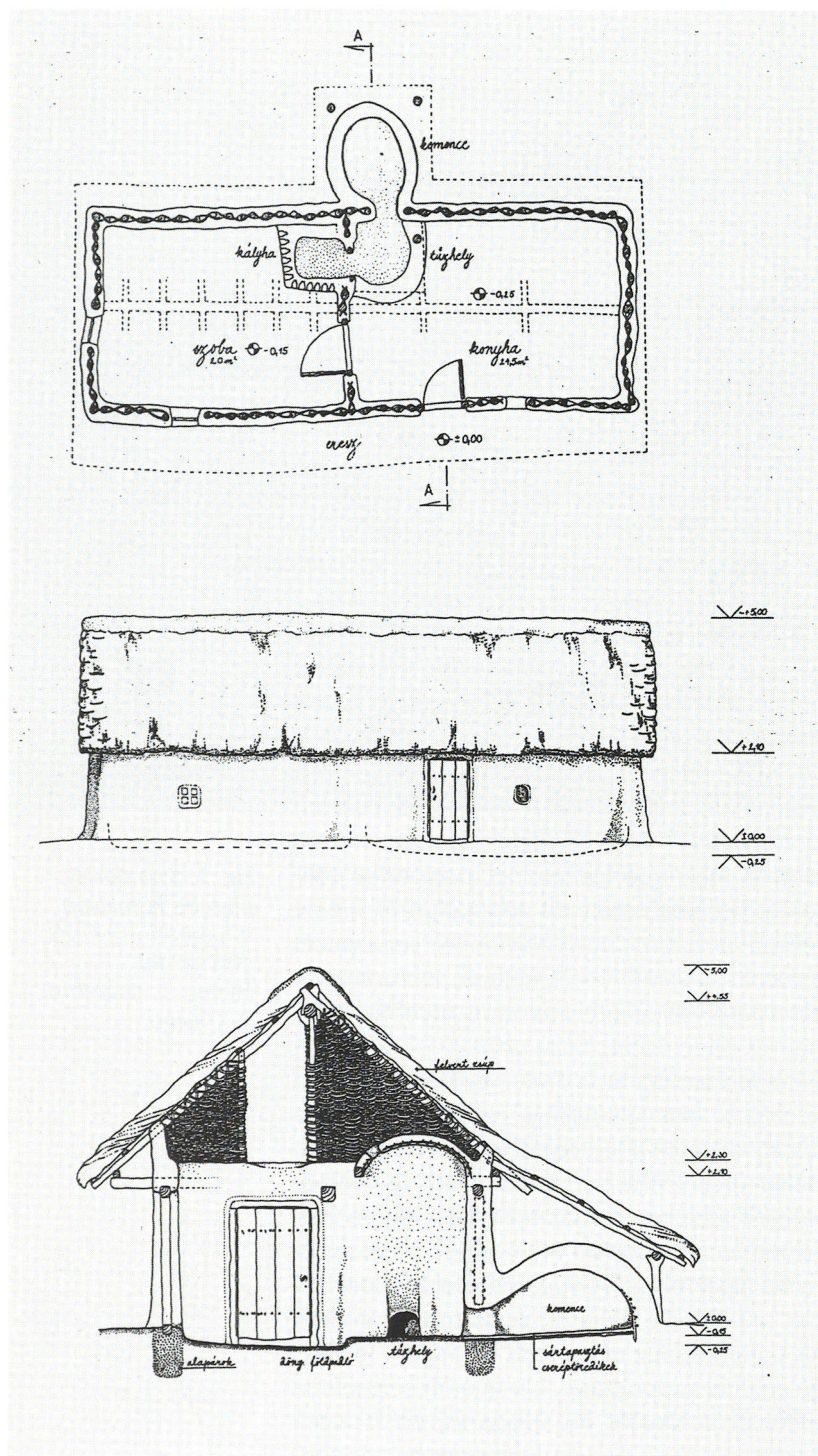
Szentkirály, reconstruction of the house N° 25: plan, façade and section.
